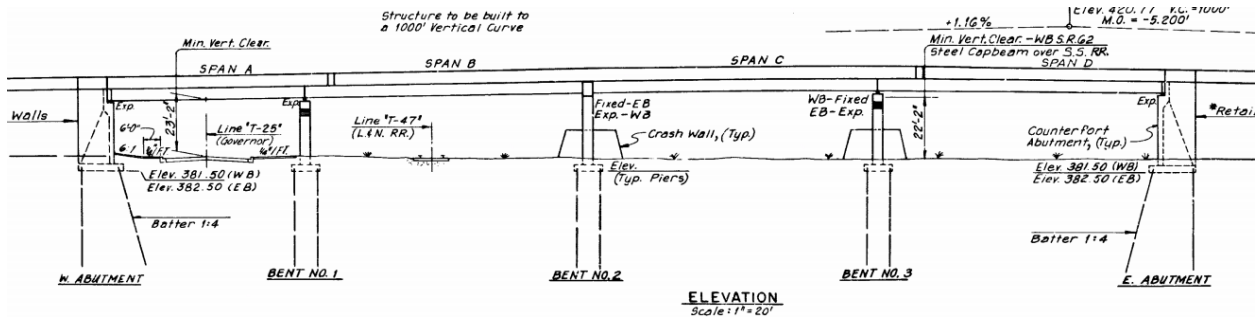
Elevation View of the Bridge (NBI 21985) (1984)
